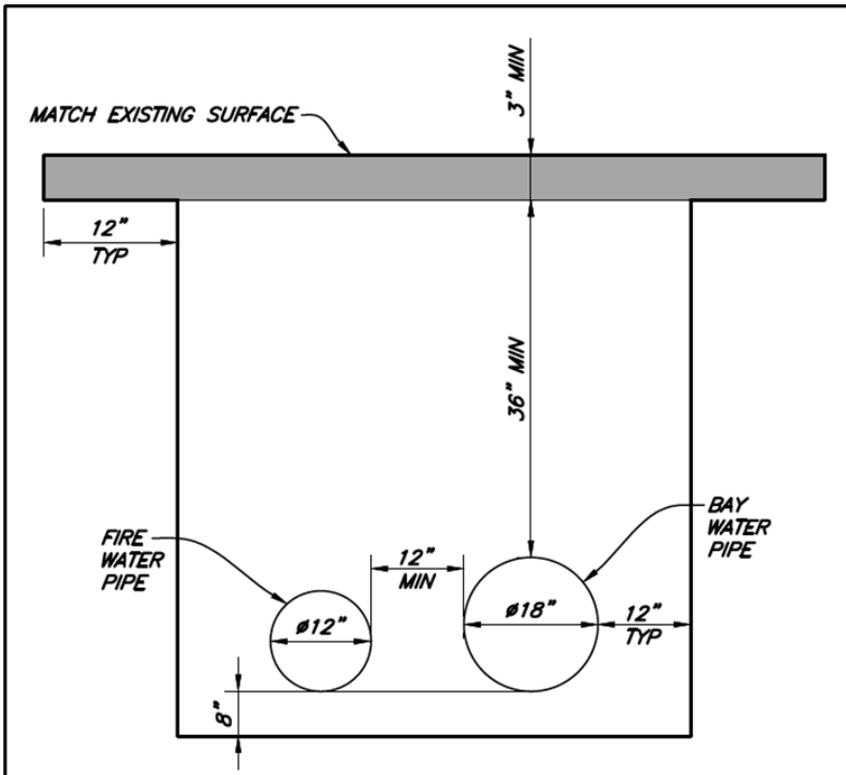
Conceptual Trench Details in Areas Where the Bay Water Line and Fire Suppression Line Would Occur
